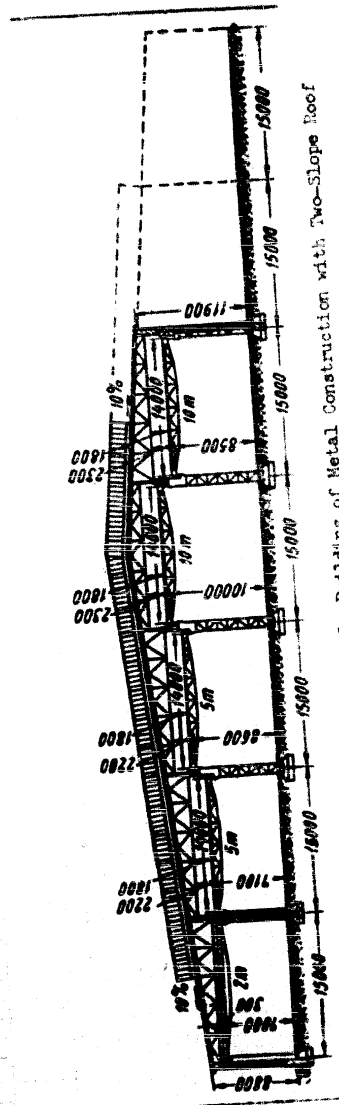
Cross Section of Five-Aisle Building of Metal Construction with Two-Slope Roof
